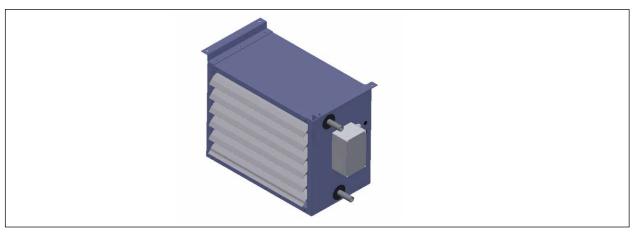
Ceiling-mounting LH with ceiling suspension Z
